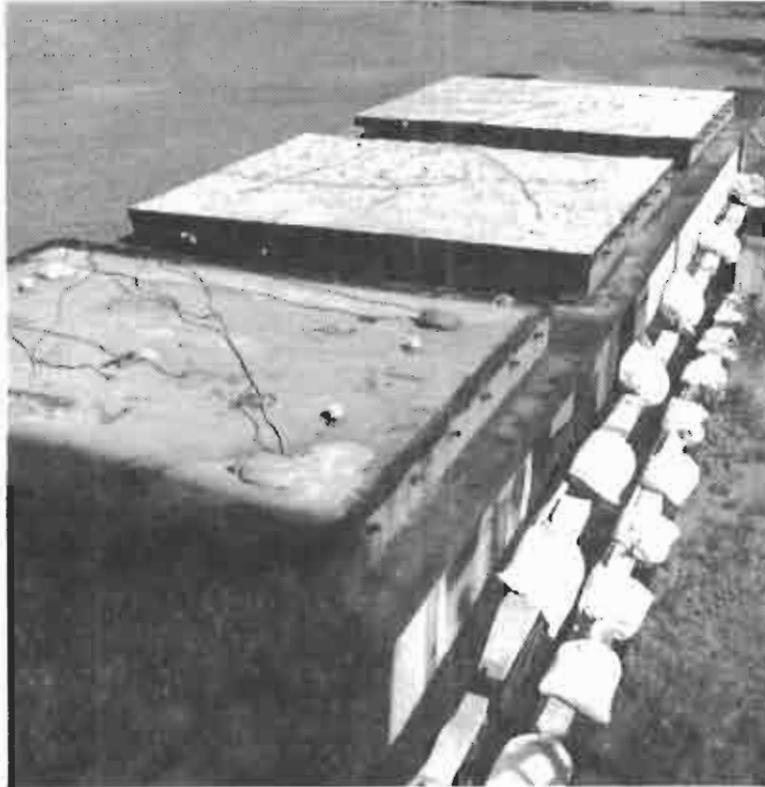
View of Three Reinforced Concrete Test Slabs Used in CPCC Overlay Study.
